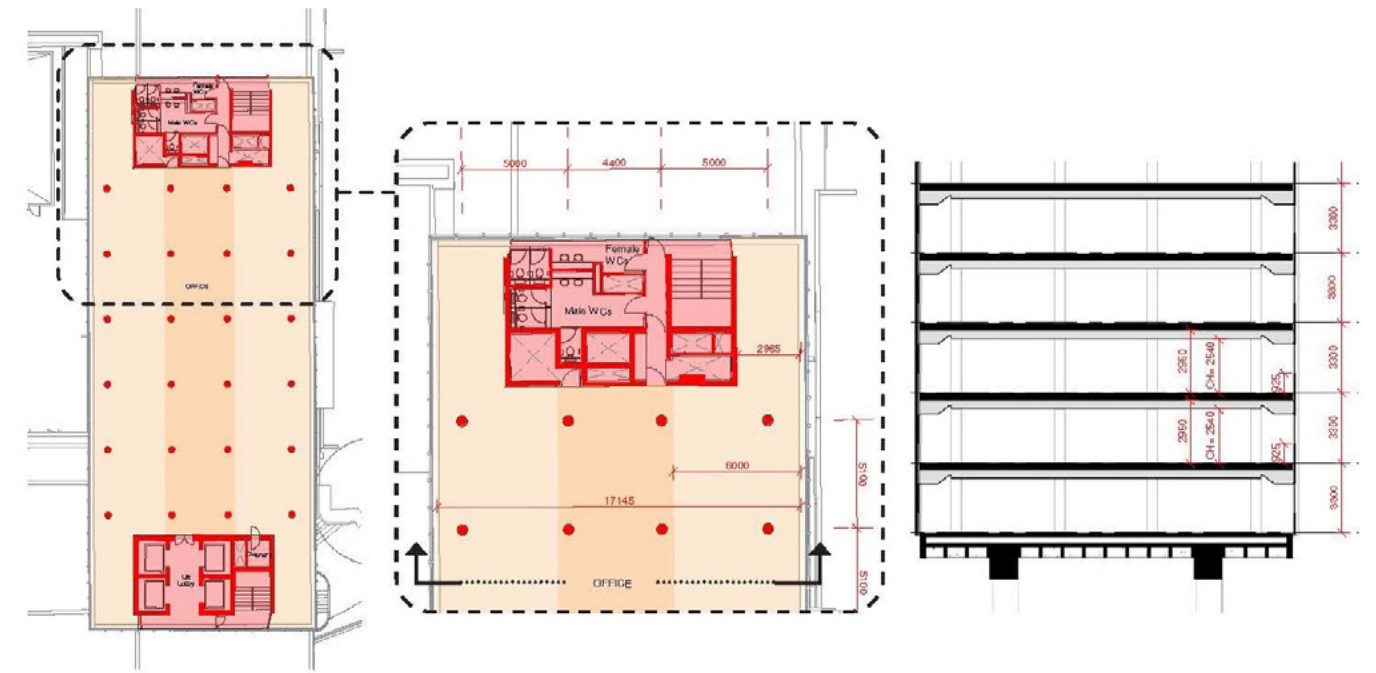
2 Existing typical office floor in Bastion House demonstrating constraints
